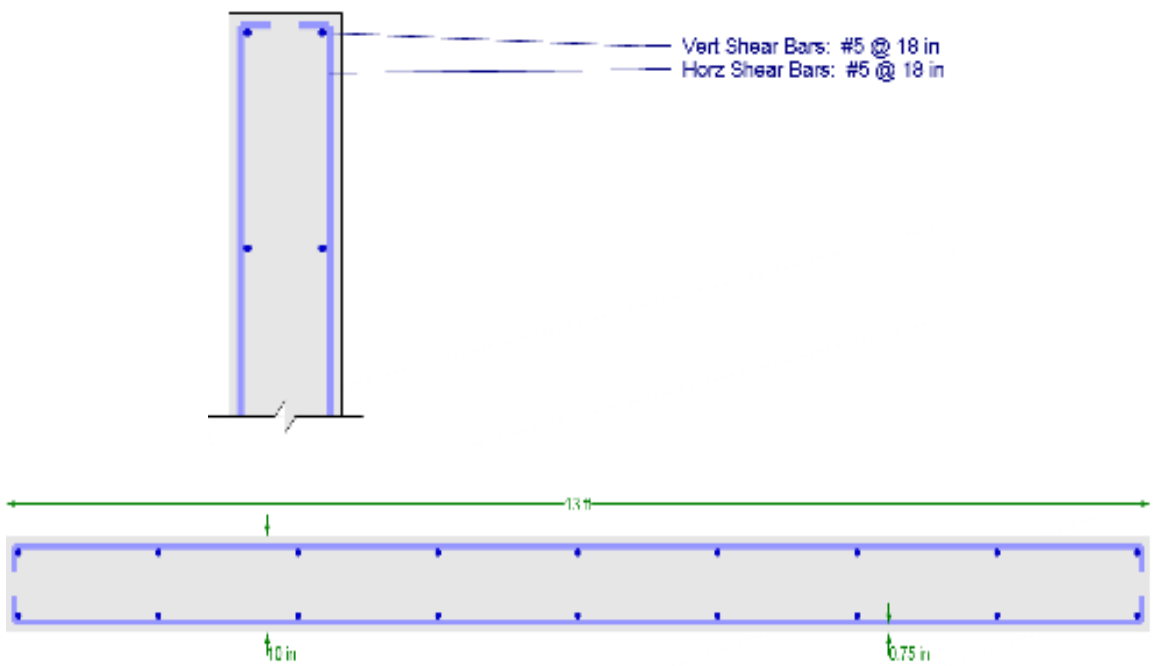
Building (B6-9S-M-S) Special RC Shear Reinforcement Details; Wall Section for Floors 7-9
